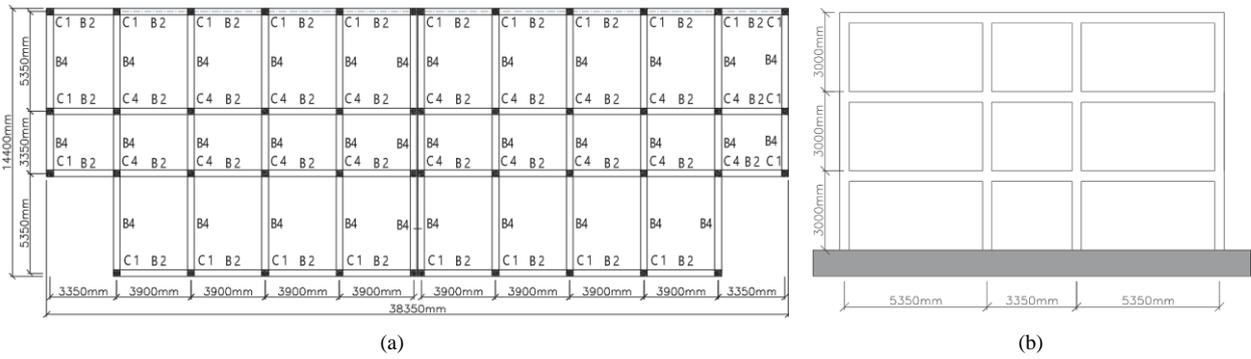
B-type three-story RC structure (a) first-floor plan, (b) RC frame (transverse direction)
